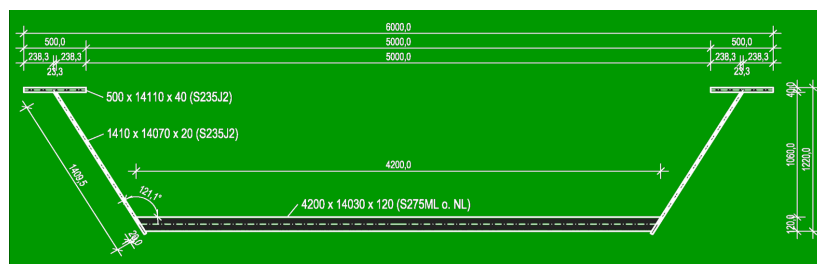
Principle cross section of new Brunngraben Bridge [5].
